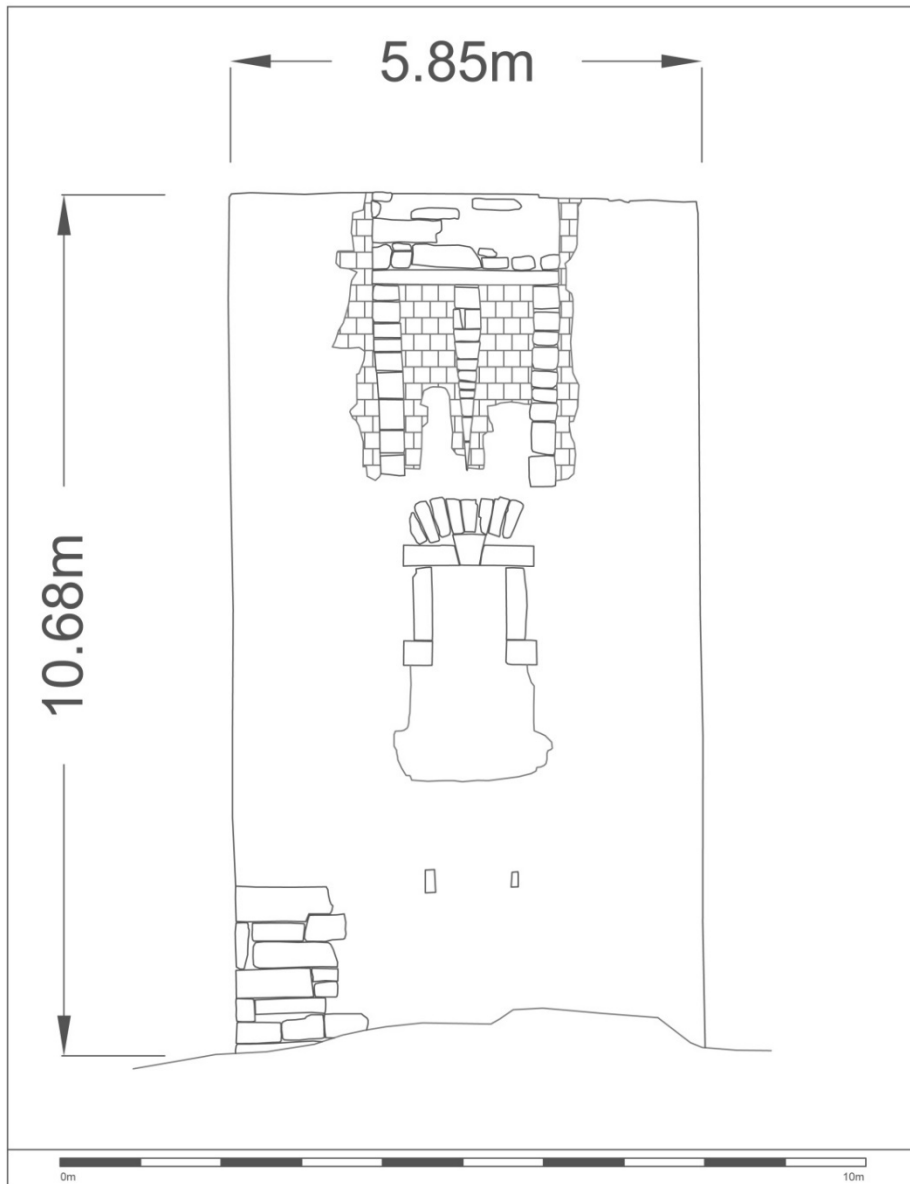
External elevation of the south-west wall of the signal tower at Inisheer Signal Station.
